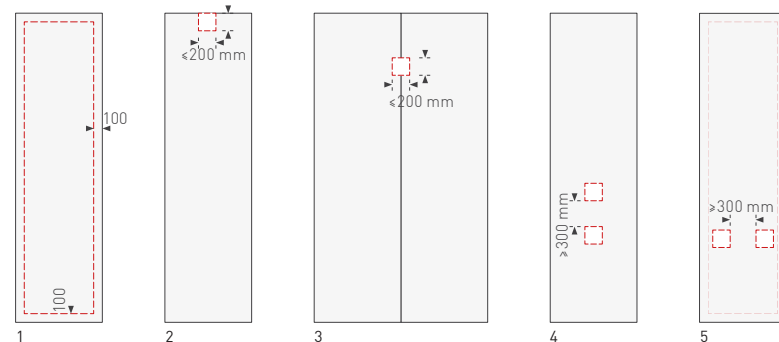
Dimensions of cut-out openings without additional reinforcement
